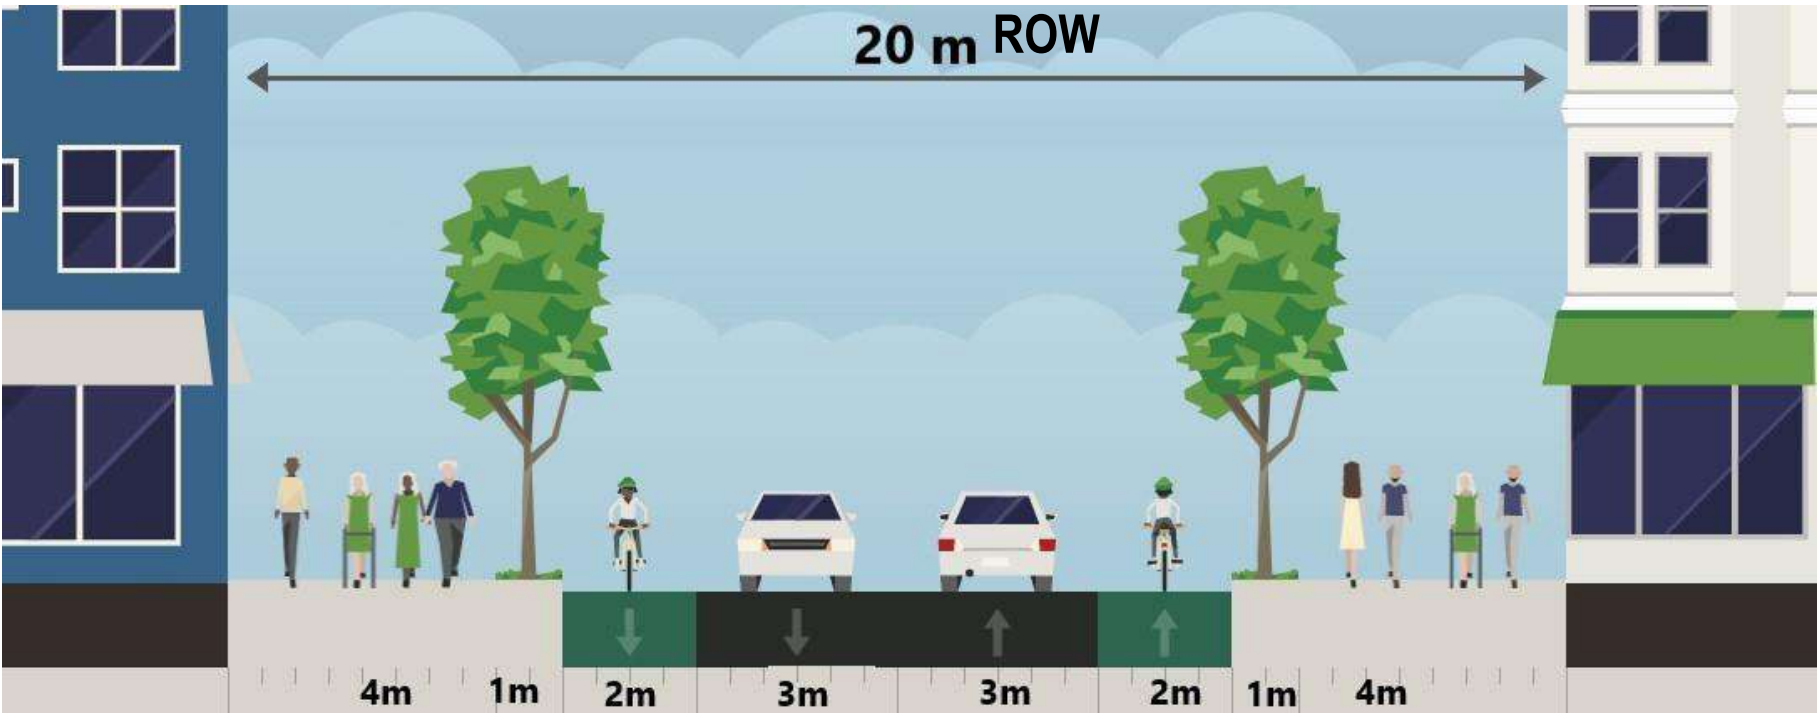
Concept 1 central street cross-section (SURP, 2019)
